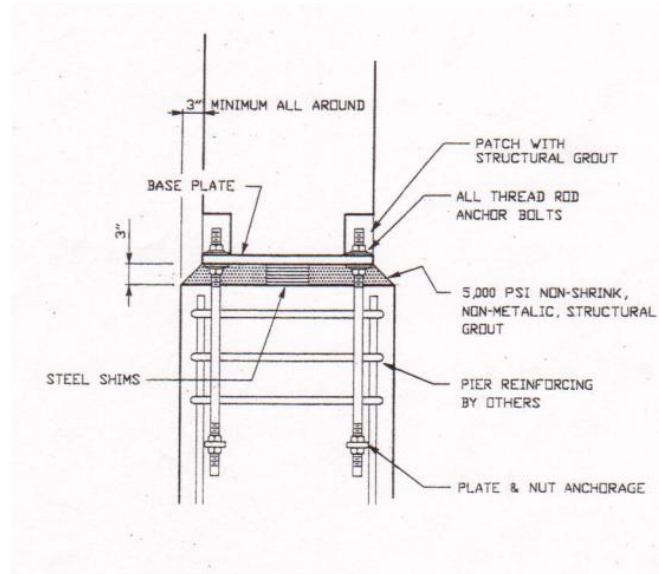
Concrete Column Splice Connection(image provided by Nitterhouse Concrete Products)
